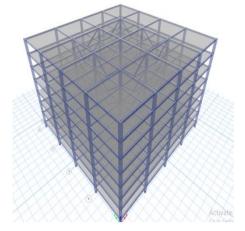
G+6 Building with V-Bracing walls on inner peripheral walls
